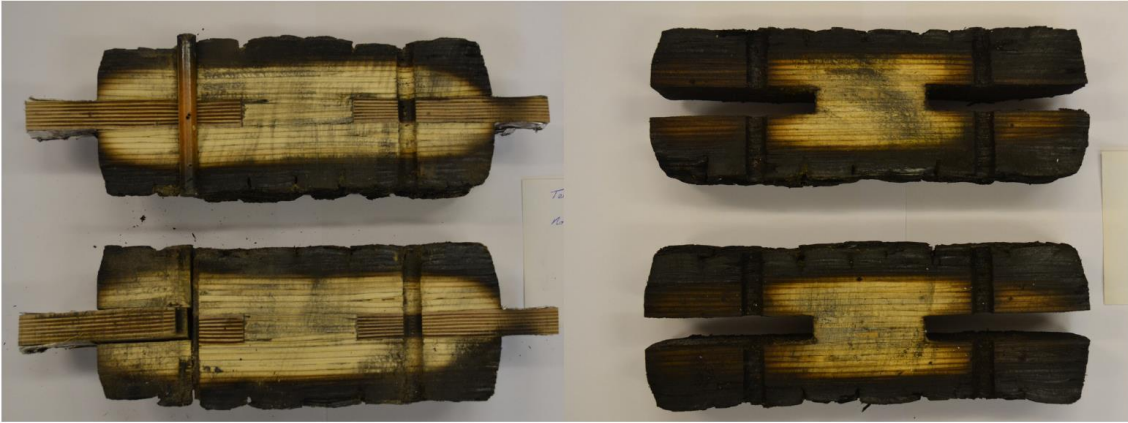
Longitudinal section of typical non-metallic (left) and metallic (right) connections after 50 minutes of heating
